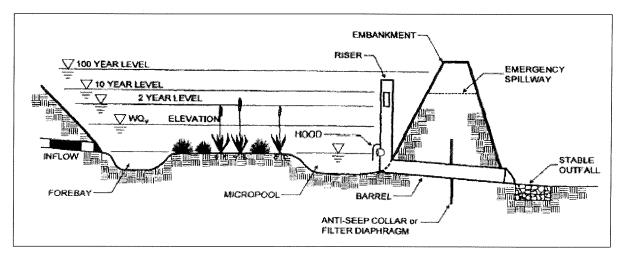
Typical Dry Extended Detention Pond in Profile
